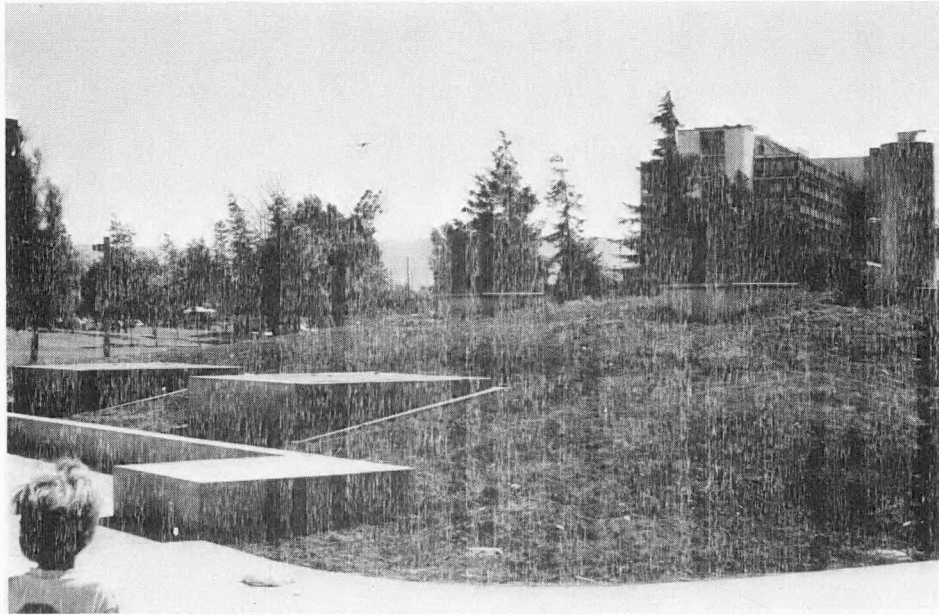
Underground Hot and Cold Water Storage Installation
